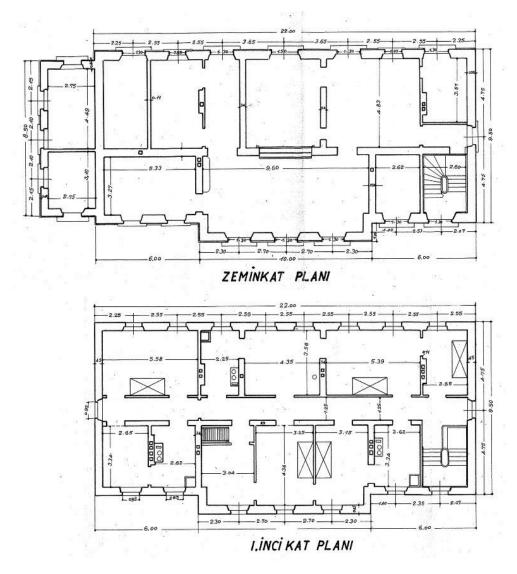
II^{nd} class station building project / Ground and first floor plans
